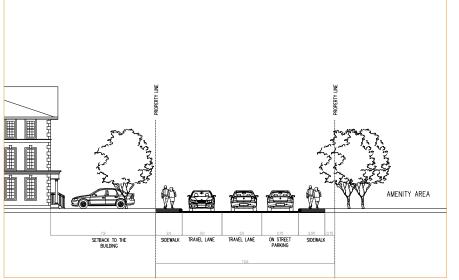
Illustrative Streetscape Section - 13.5m Private Condo Road
